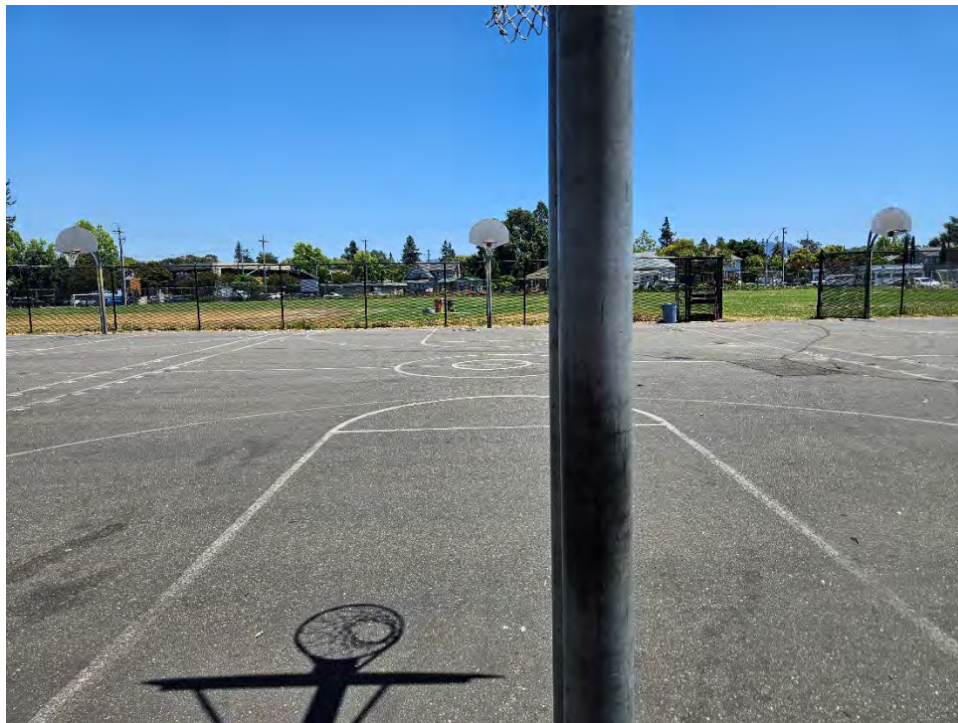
Site overview. View of proposed site of Zinnia Building E, facing southeast towards 5<sup>th</sup> Street.
